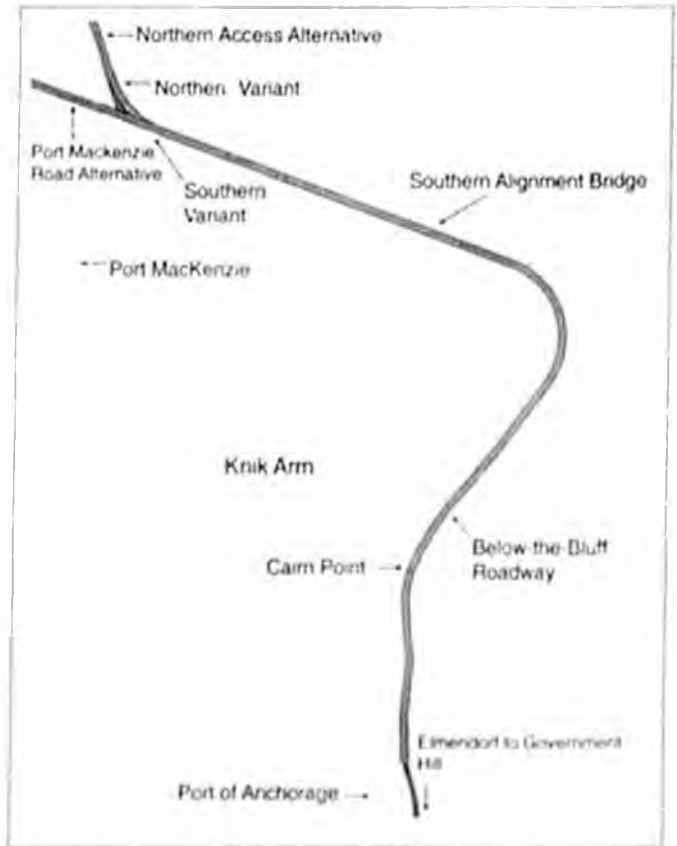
The Southern Alignment bridge alternative and Below-the-Bluff Roadway alignment are highlighted in orange.
